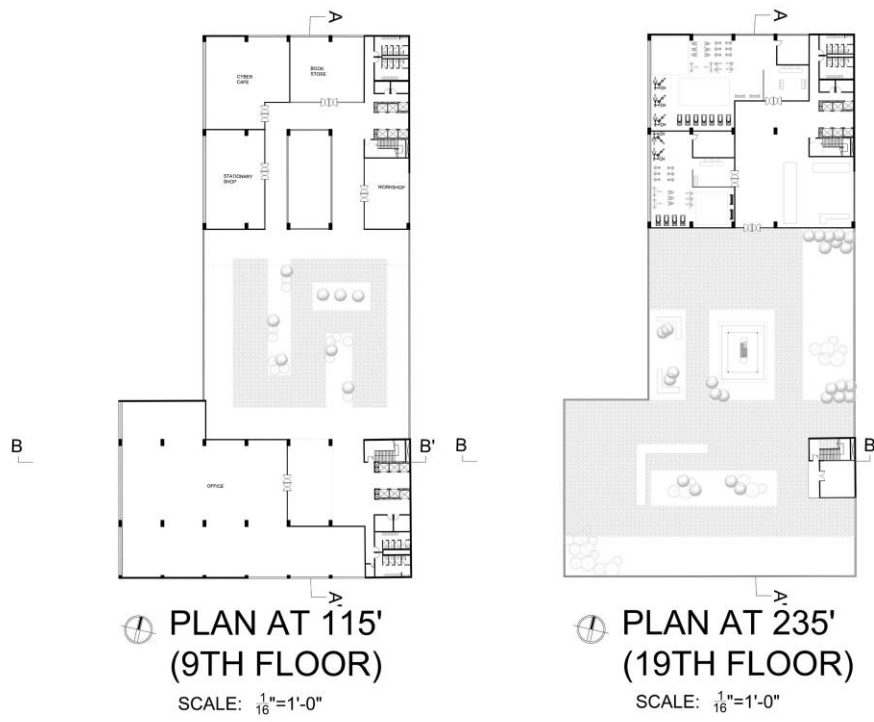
9<sup>th</sup> and 19<sup>th</sup> floor plan
